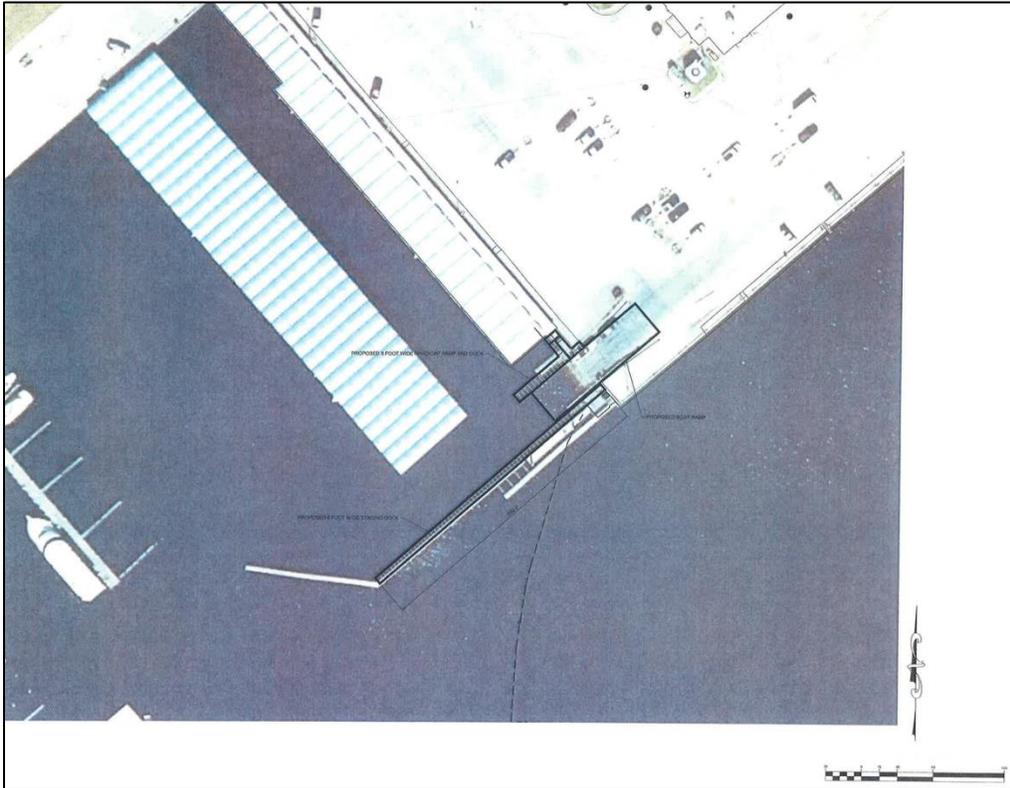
Drawing of the proposed fishing pier at the Panama City Marina, illustrating the proposed dimensions and height above mean high water.
